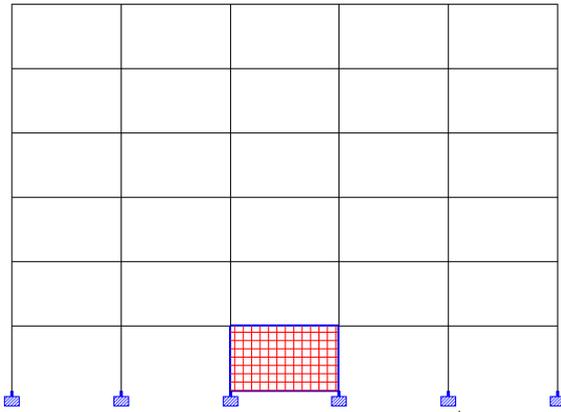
Model 7 – Shear Wall up to 1st Floor
